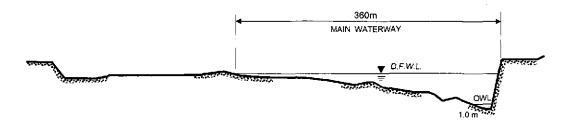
TALAVERA RIVER SECTION AT PROPOSED SITE LOCATION
